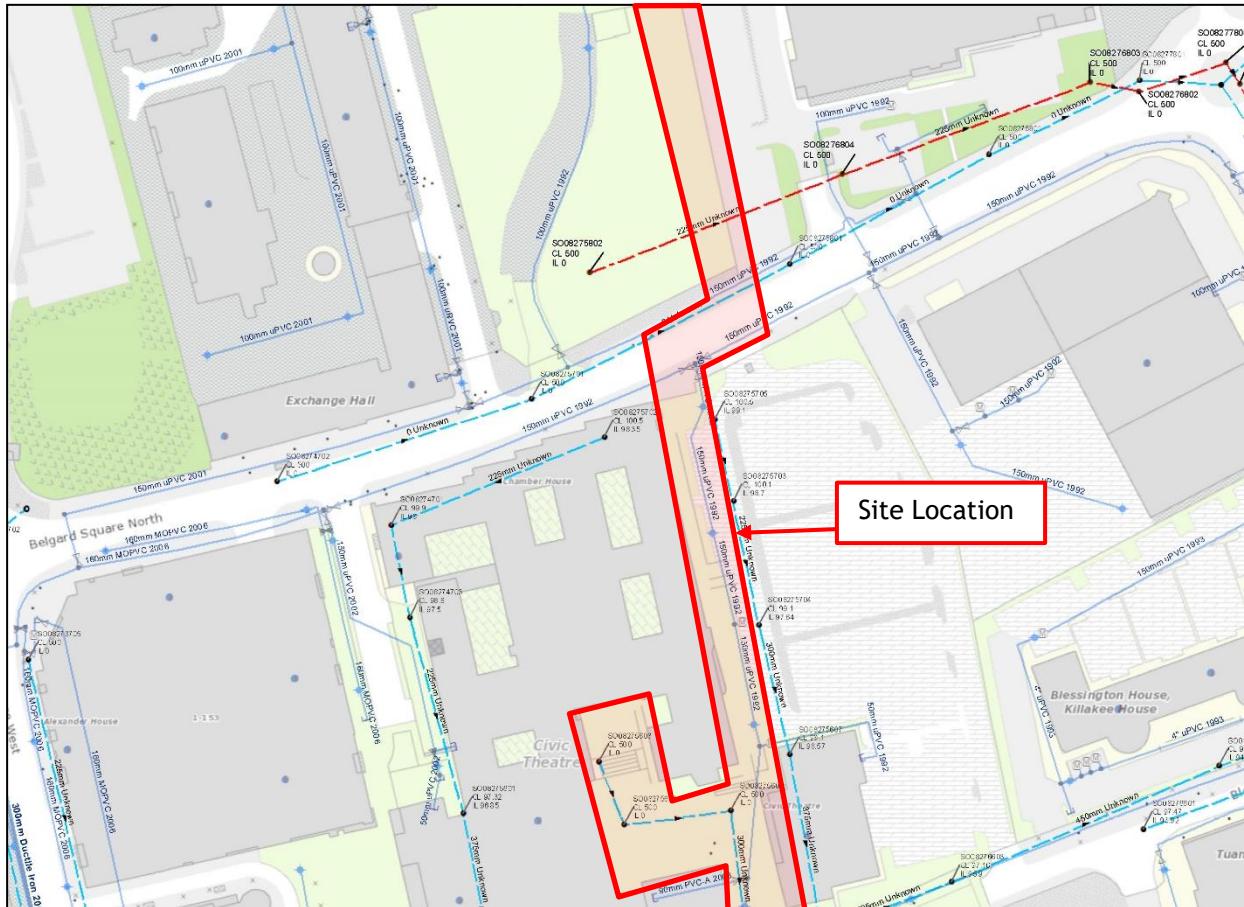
Existing surface water drainage surrounding the site (Extract from Irish Water records)
